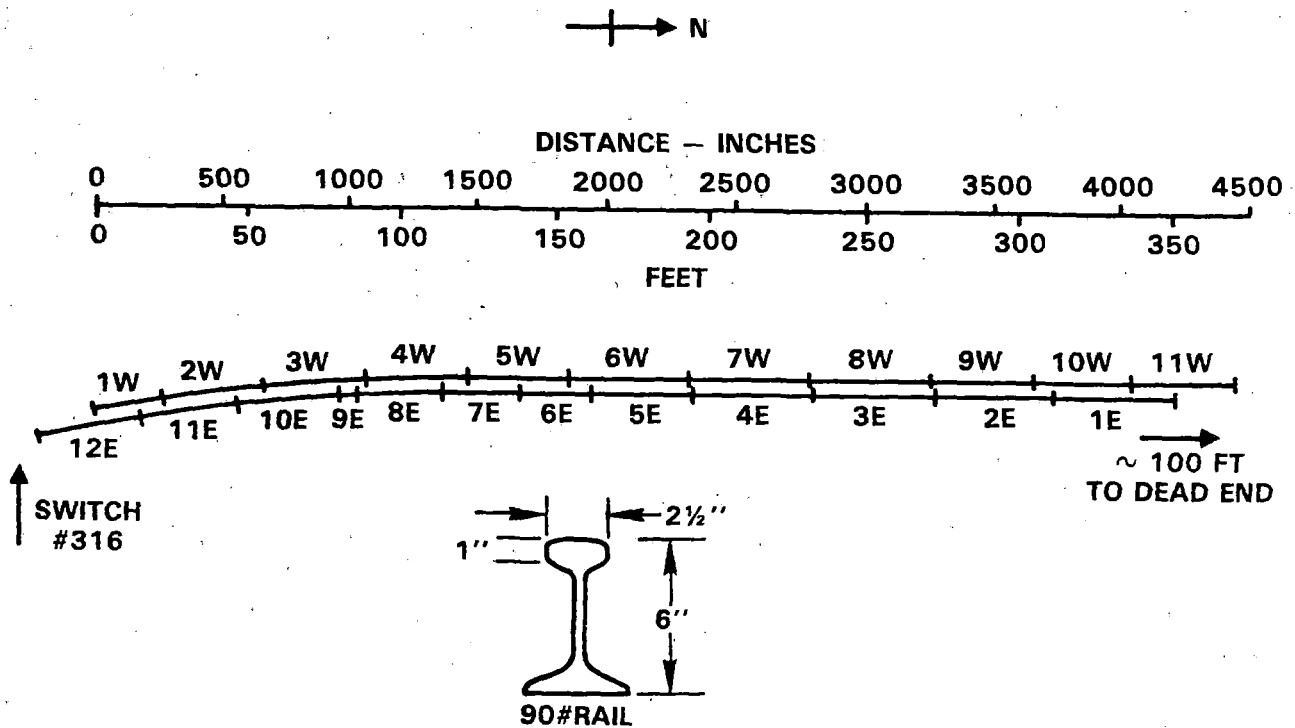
IDENTIFICATION OF SANTA FE TEST TRACK RAIL SECTIONS
